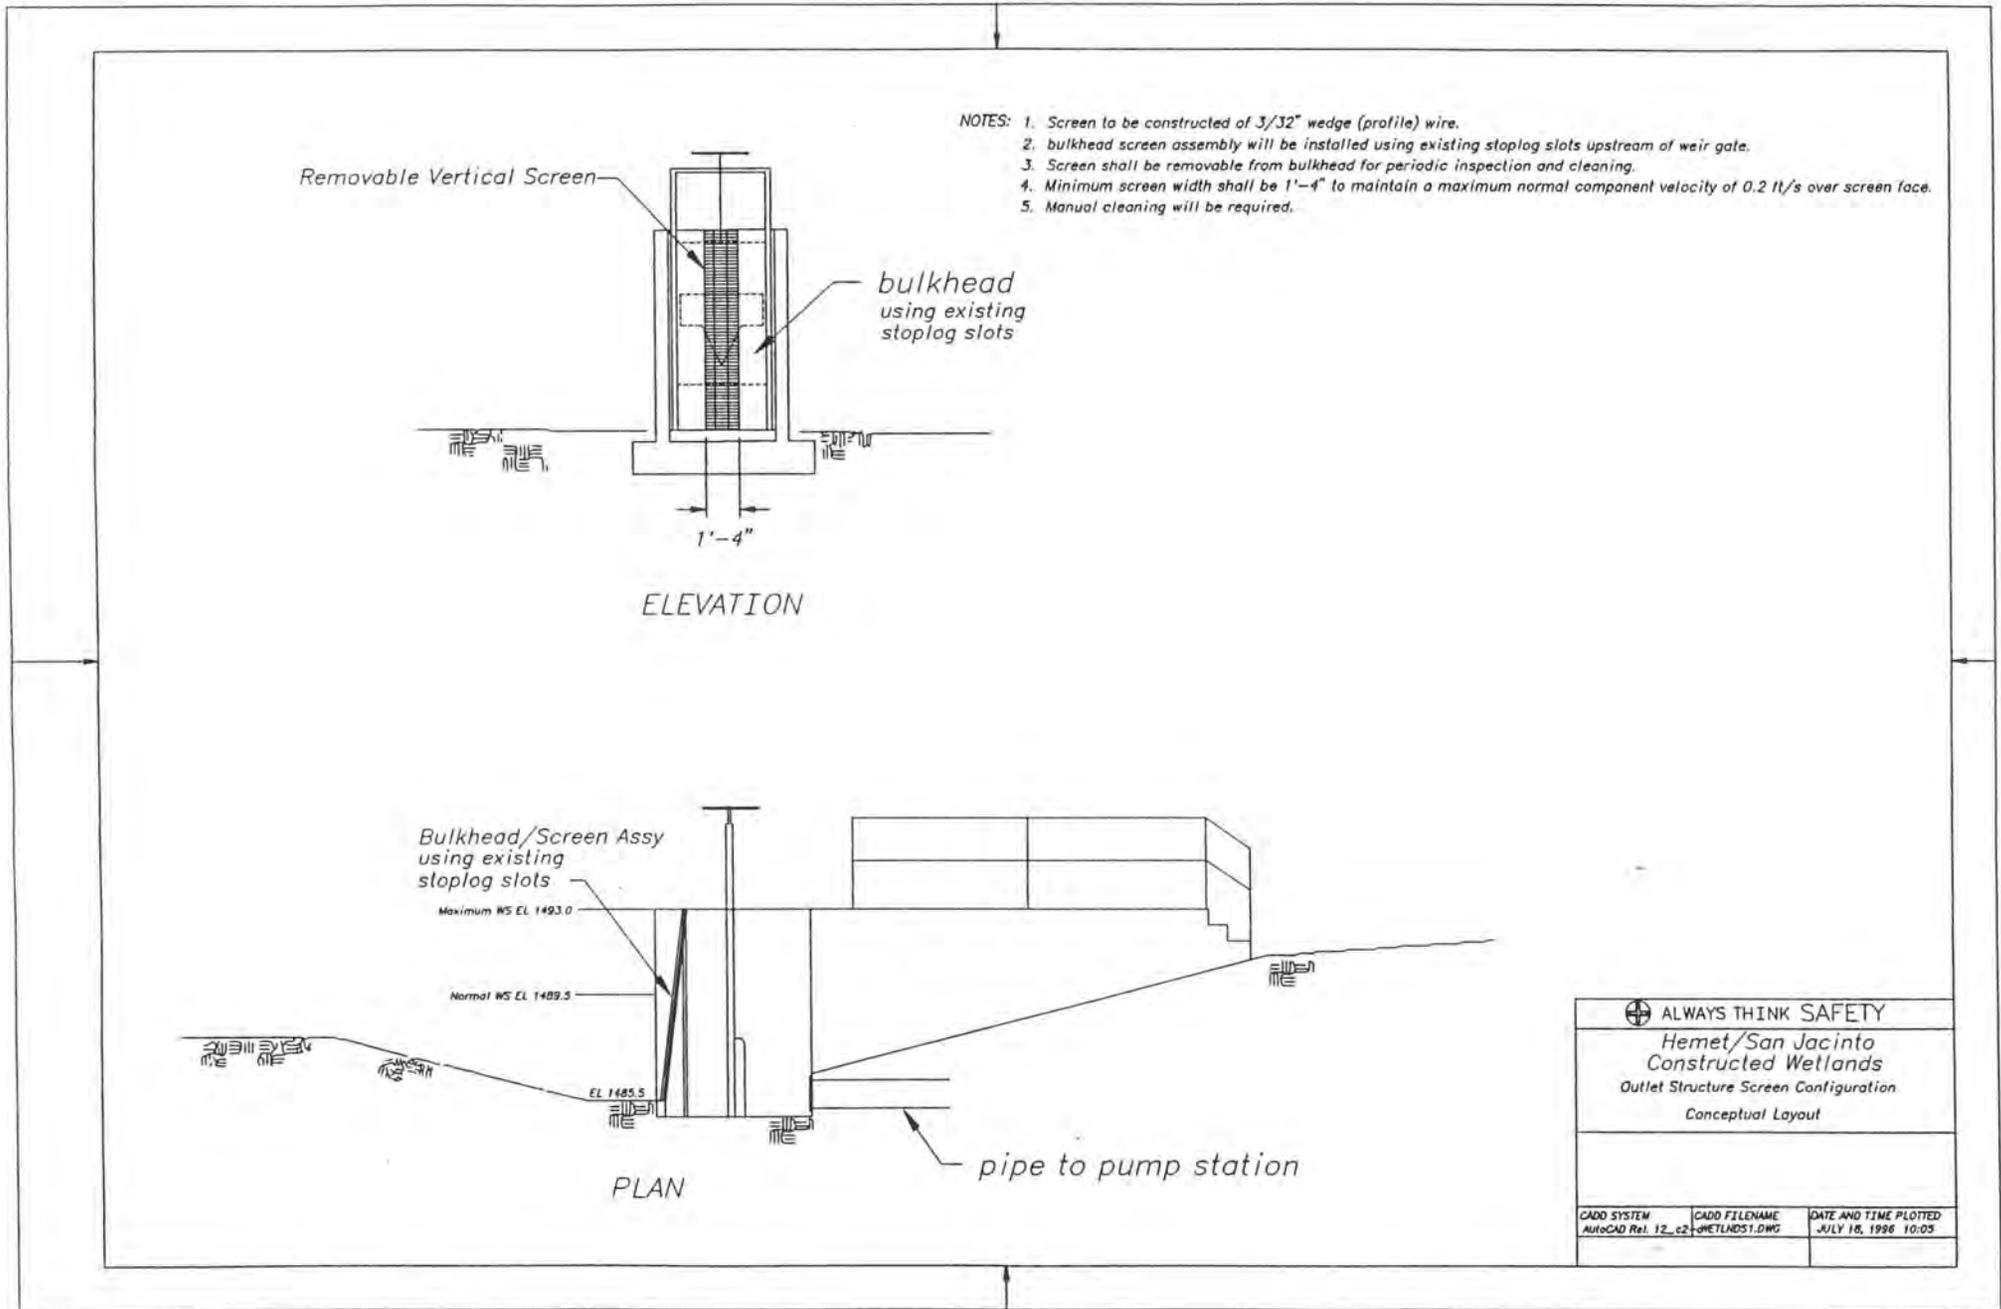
Conceptual layout of proposed screen concept for each outlet structure.
